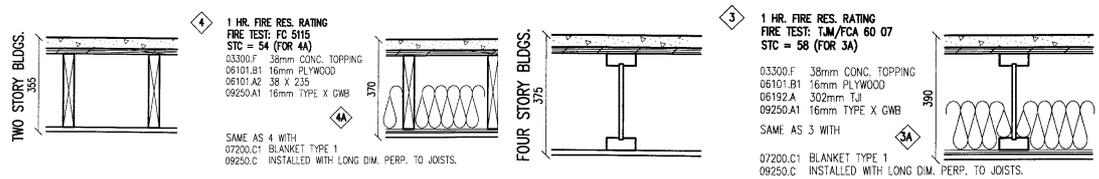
Drawing 780-06-002, Typical Combustible Floor Construction
